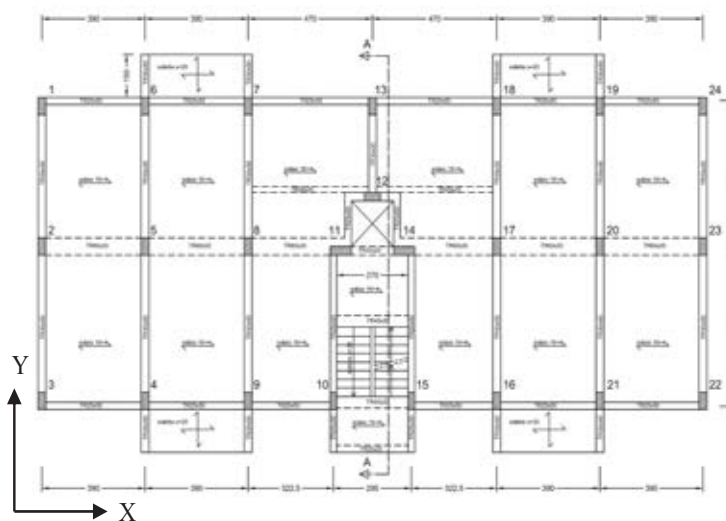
Schematic plan configuration of the building. (Dimensions in cm)
